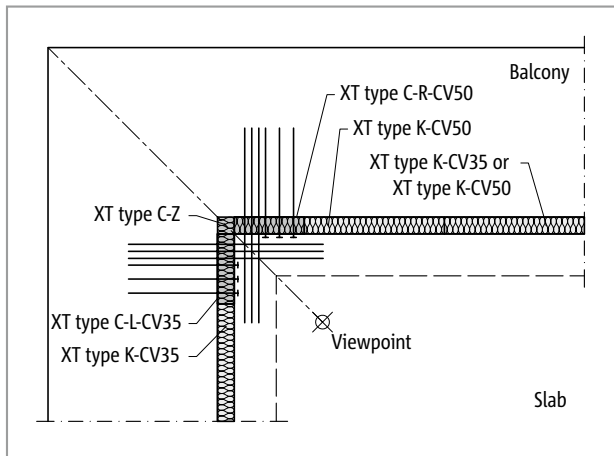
Schöck Isokorb® XT type C: Balcony with outer corner freely cantilevered (application XT type C-L-CV35, XT type C-R-CV50)
